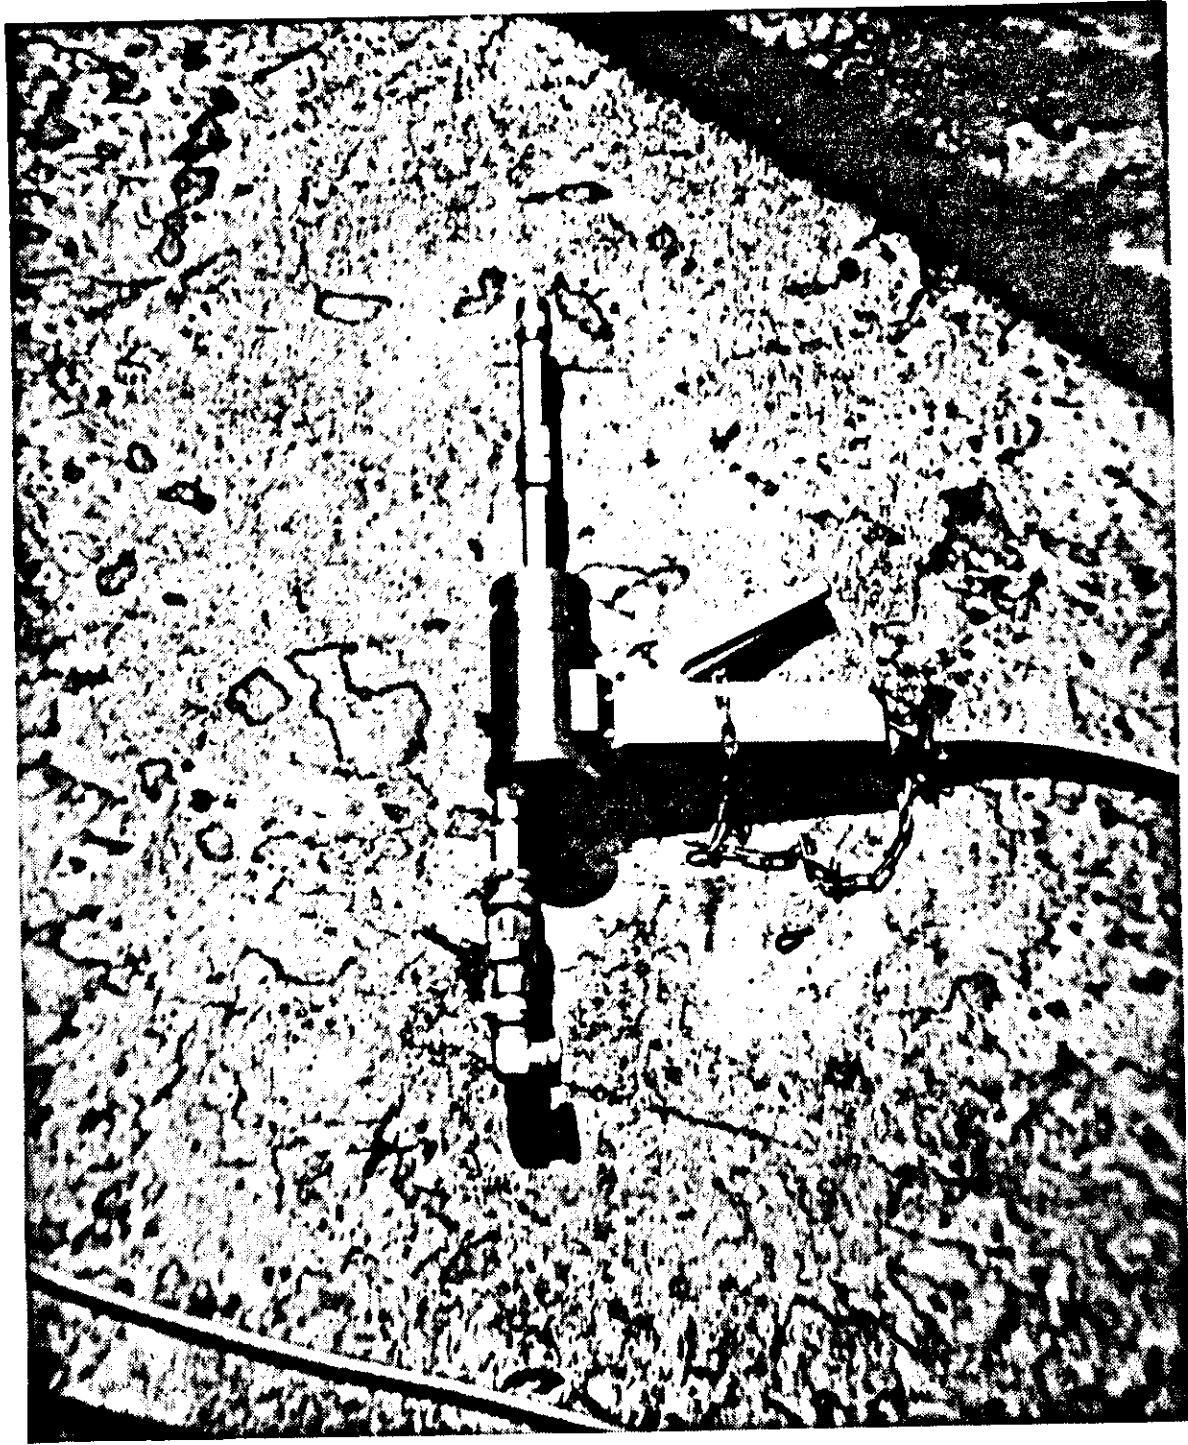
PHOTOGRAPH OF THE GUN AS IT WAS ASSEMBLED FOR USE.
